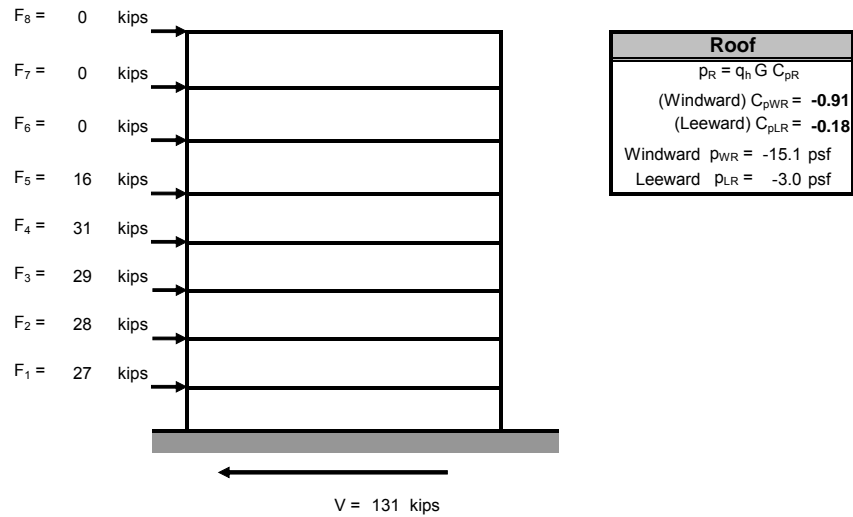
Wind Load Calculations for Staggered Truss System, EW Direction
